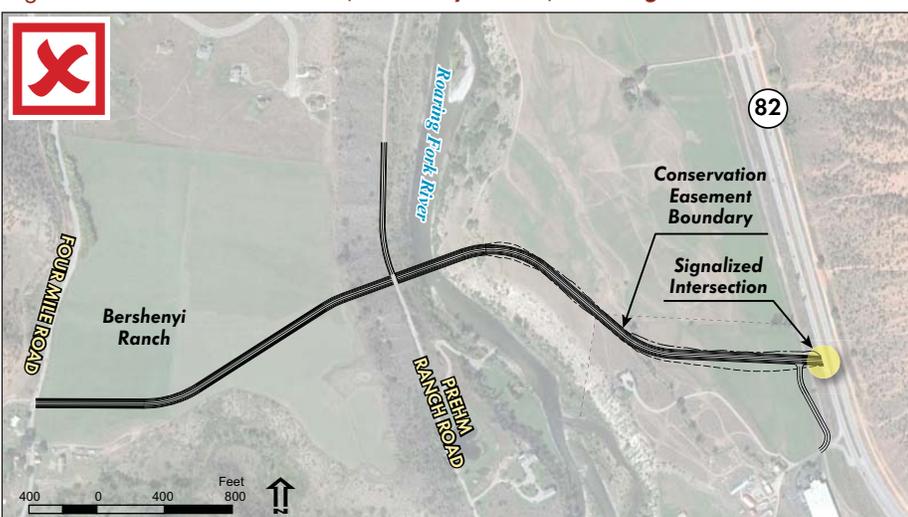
Alternative No. 26, Prehm Ranch, North Route, Crossing E
